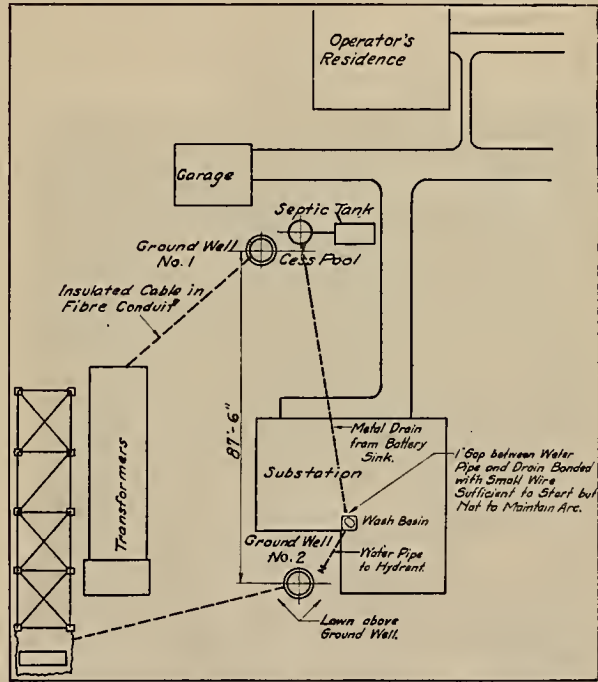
Plot plan of substation grounds where stray ground current damaged water pipe and other equipment in seeking return path to ground well.
